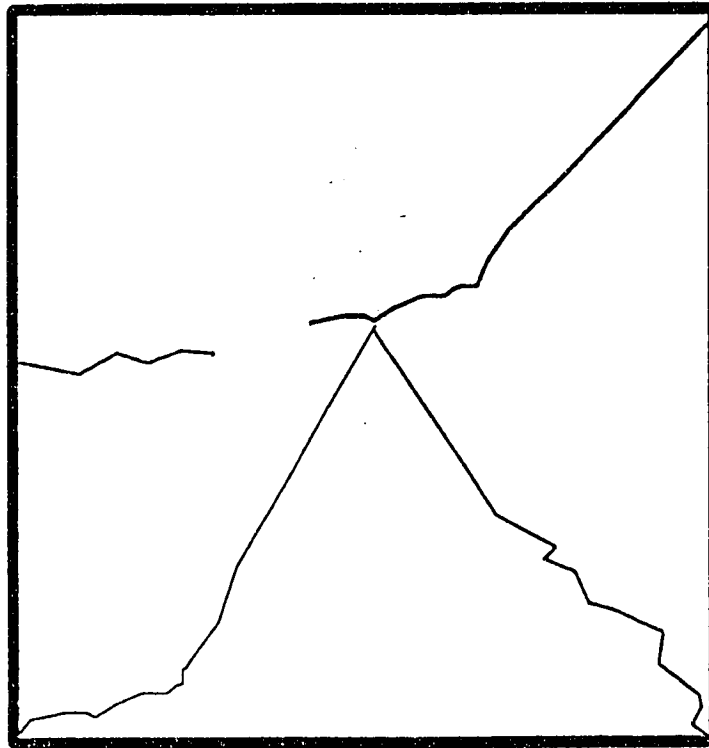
Typical Plastic Shrinkage Cracks in the Concrete Specimens Exposed to a RH of 25 %, Temperature of 45 °C and a Wind Velocity of 25 kmph
